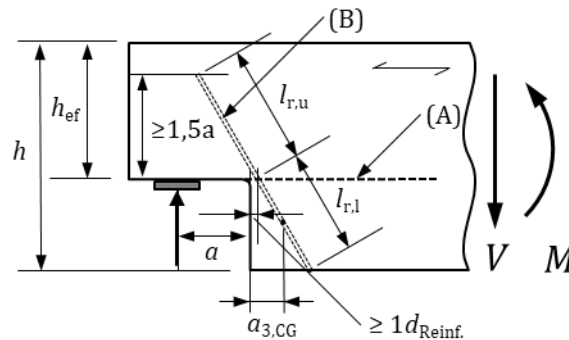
Reinforced notched beam support in the ribs of a Peetri Puit Rib Element or Box Element
